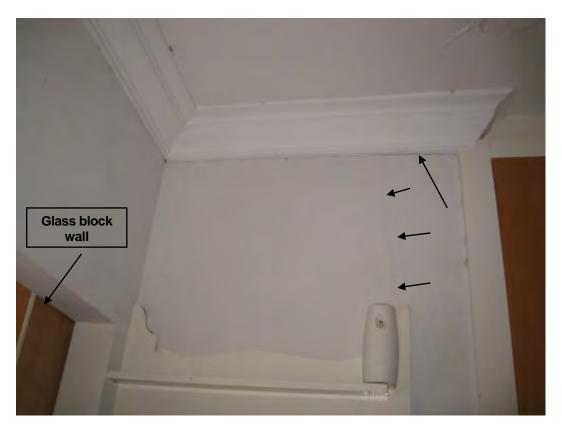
shows flaking paint to the cornice and ceiling to the western corner of Bedroom 3
